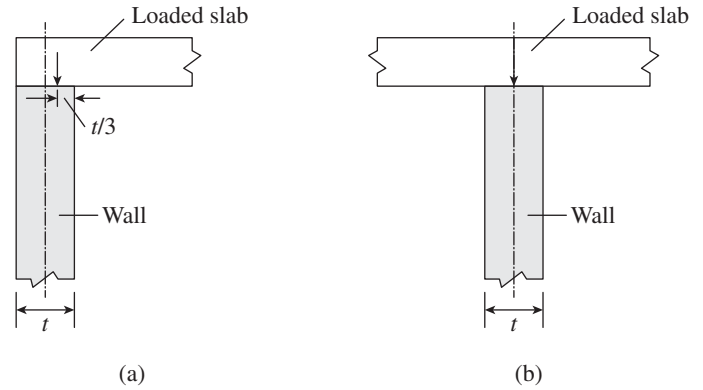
Eccentricity of loads on walls (a) Slab on one side of the wall (b) Slab on both sides of the wall
